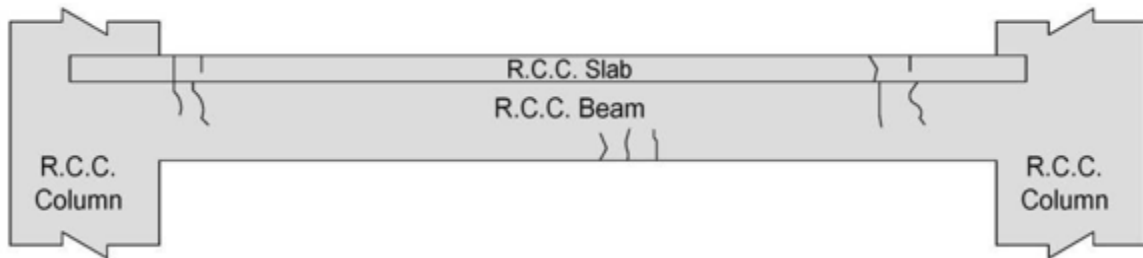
Flexural cracks in RC beams (Jaydutt Tailor, 2017).
